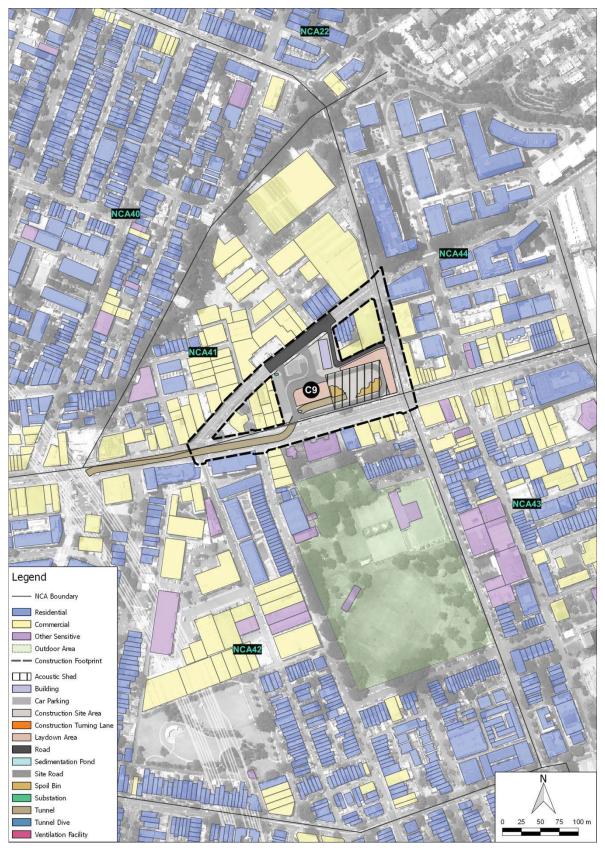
Indicative site layout – Pyrmont Bridge Road
